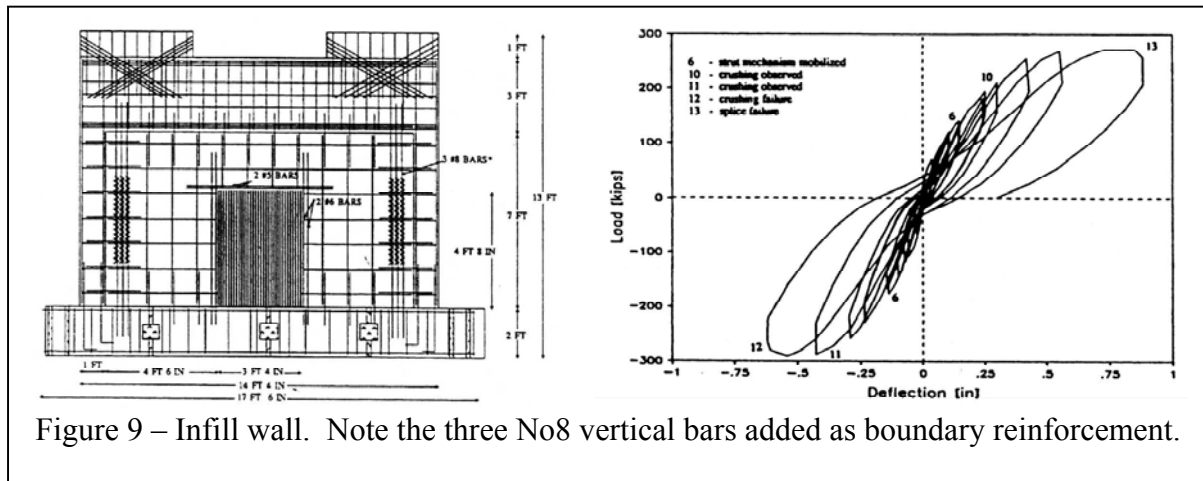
Infill wall. Note the three No8 vertical bars added as boundary reinforcement.
